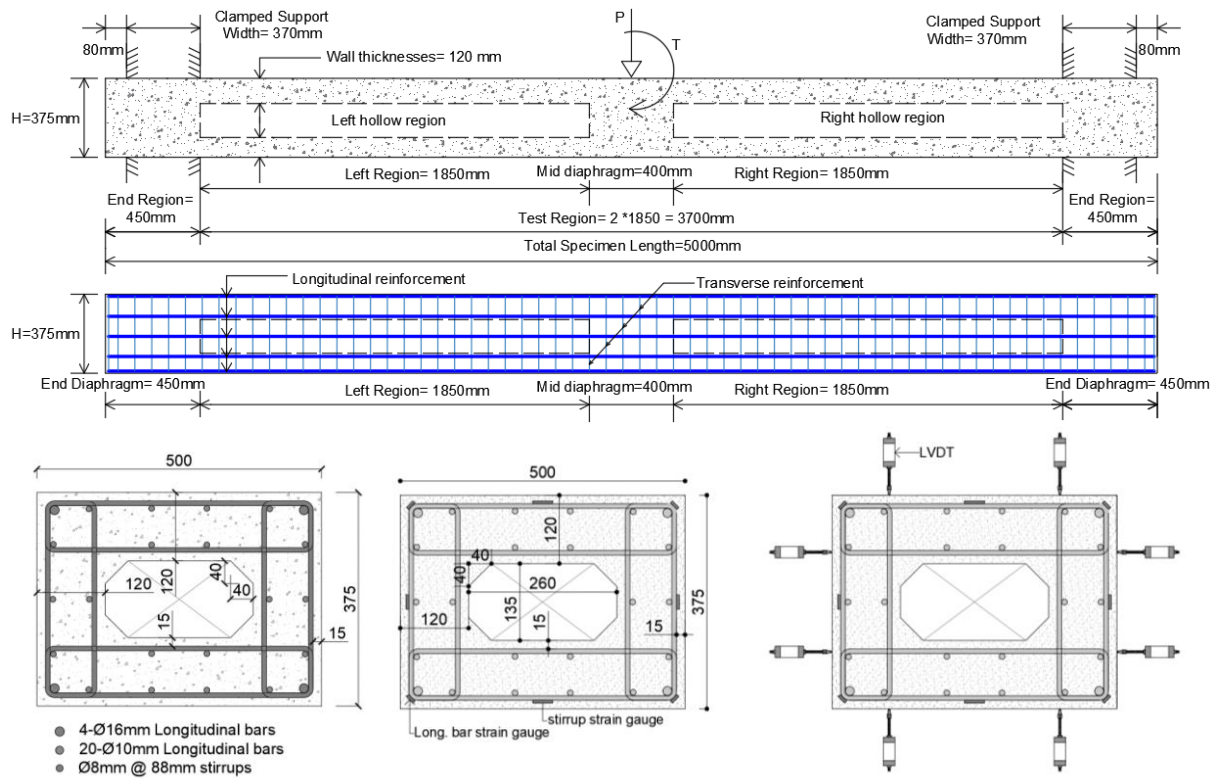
Specimen details. Top-2: Longitudinal profile, Bottom-3: Reinforcement configuration & instrumentation
